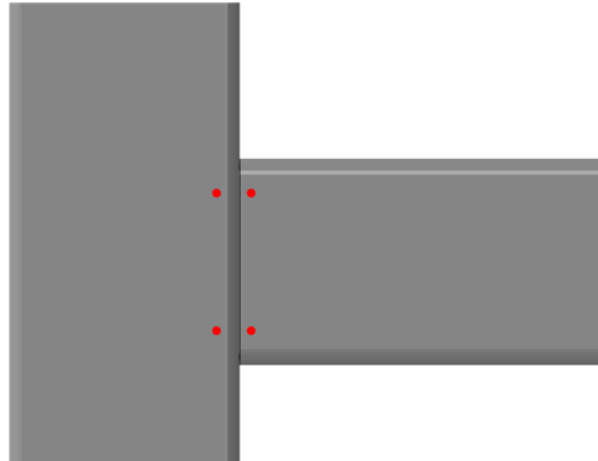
Points used for evaluating the weld behavior.
